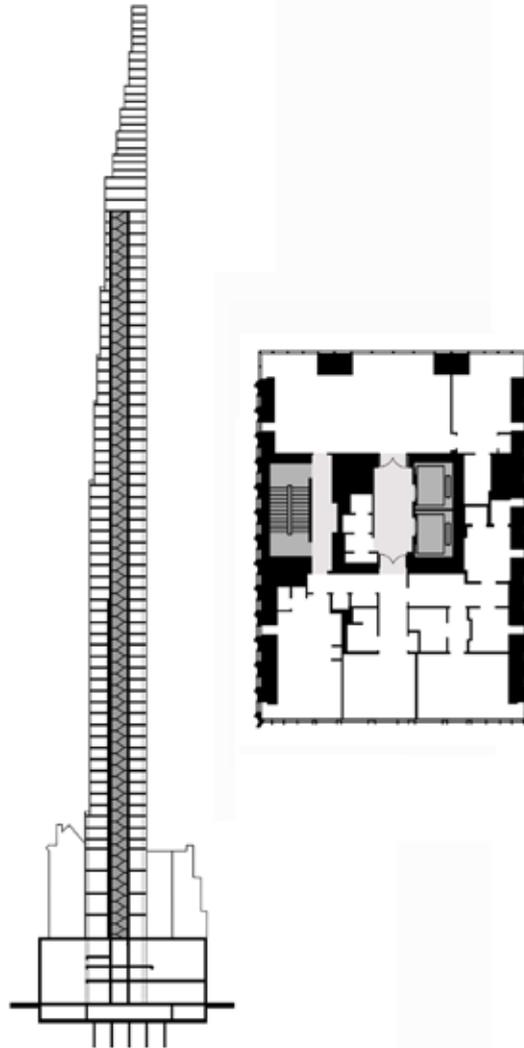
111 West 57<sup>th</sup> Street: plan and section (developed by authors based on [44])
